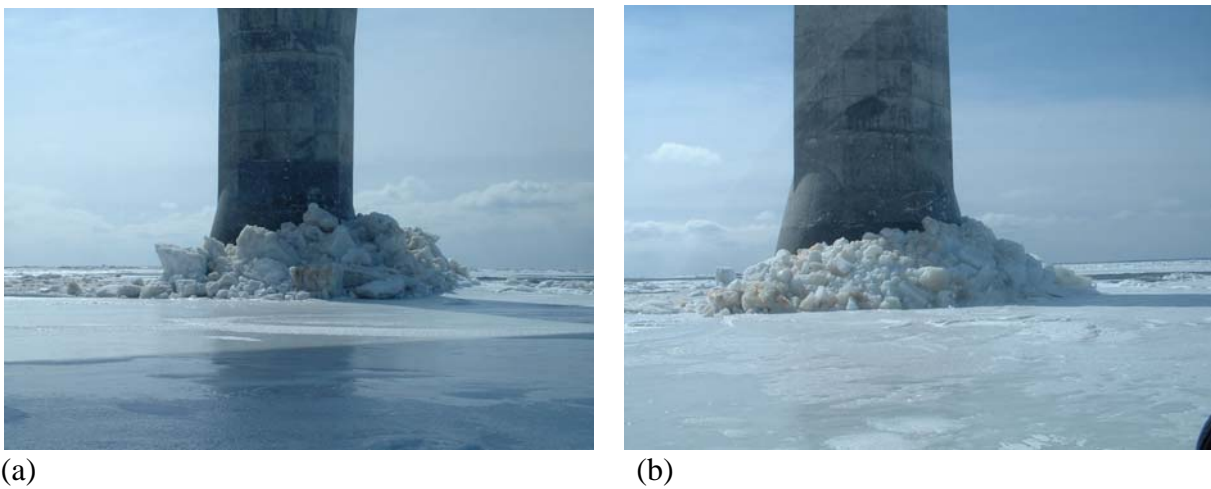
Ice crushing on piers and tensile cracks, from pier P24 looking southwest towards New Brunswick
